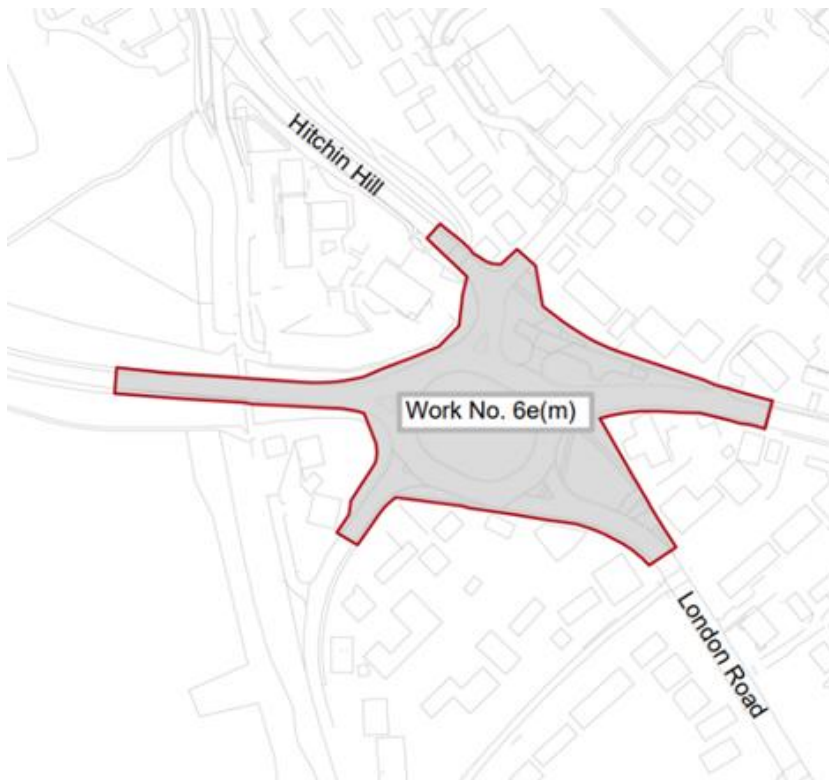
Copy of Works Plan No. 6e(m) from Work Plans (Part 6 of 6) [APP-021 – page 21].
